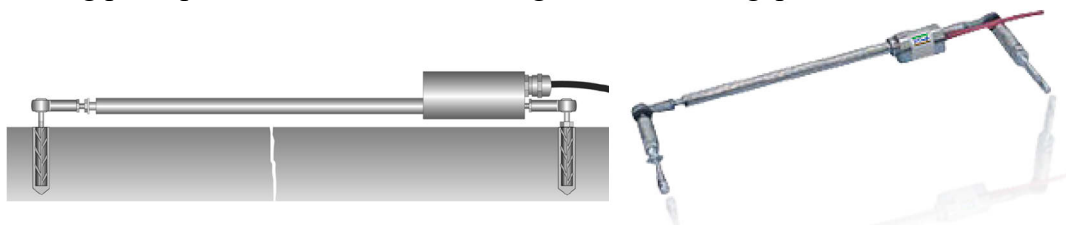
Crack or Joint meter with anchors pins epoxy glued in drilled holes
